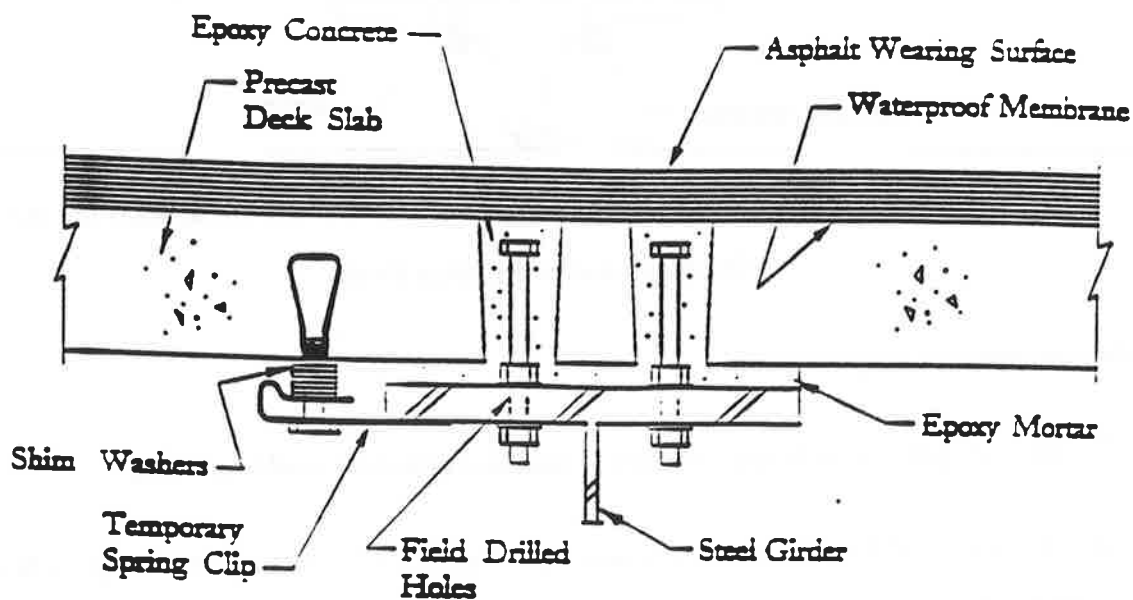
Suggested details in Survey for Steel for Steel Girder-Deck Joint for the Existing Deck.
